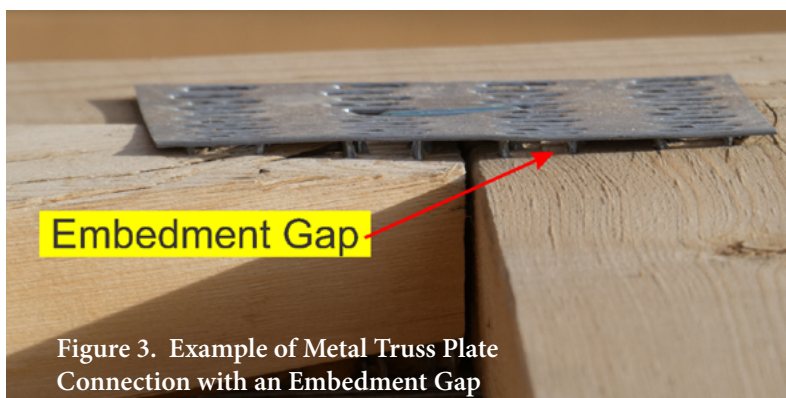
Example of Metal Truss Plate Connection with an Embedment Gap
